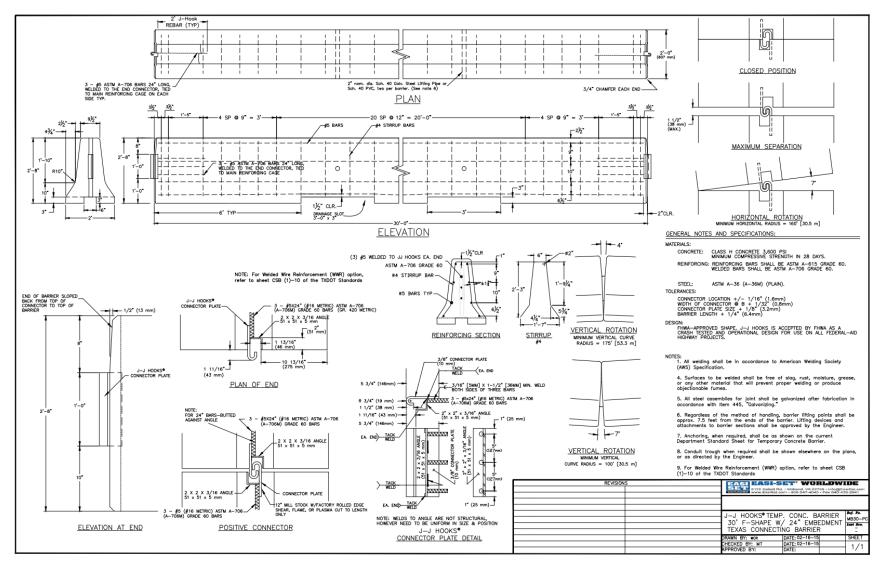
F-Shape Concrete Barrier with JJ Hook.
